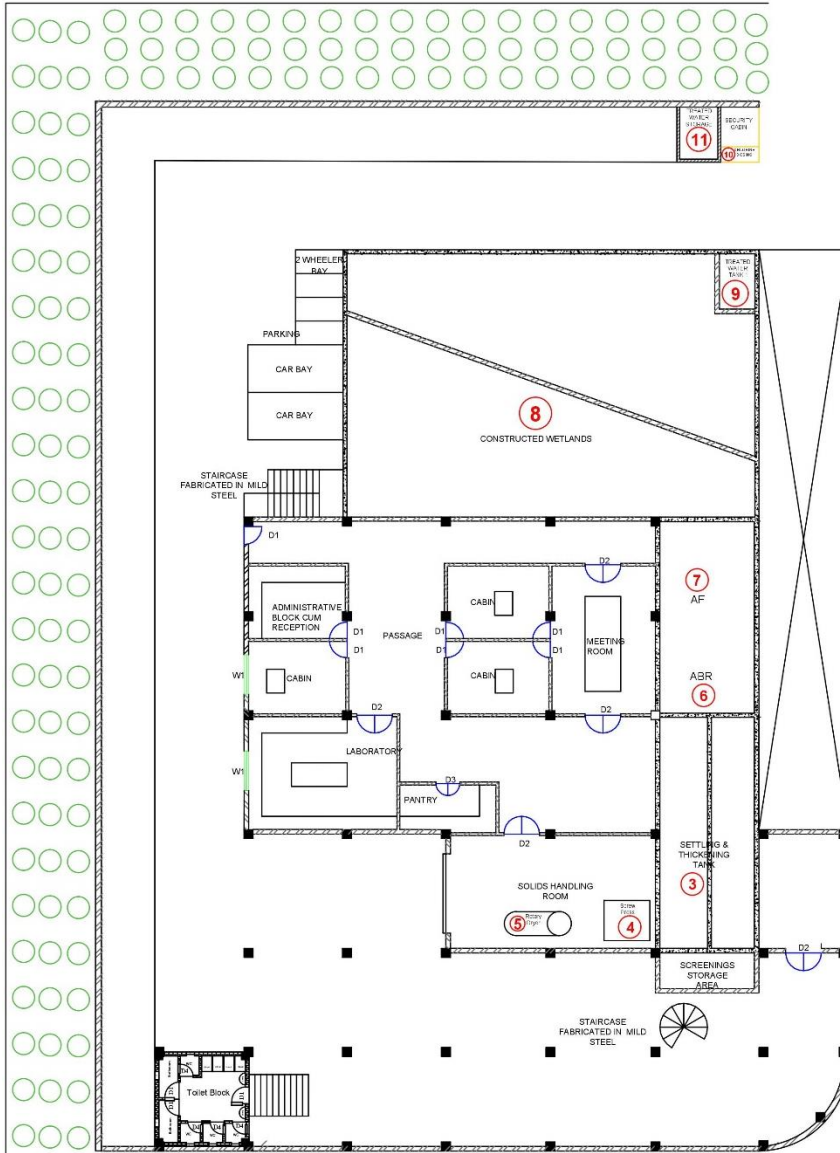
LAYOUT OF PROPOSED SEPTAGE TREATMENT PLANT (SeTP) SITE - FIRST FLOOR
